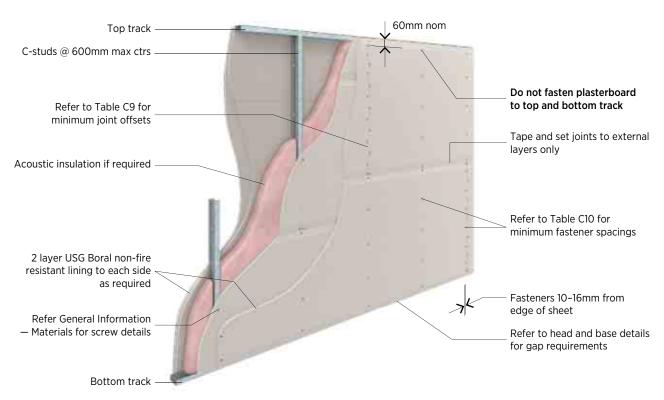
Non-Fire Rated Steel Stud - Horizontal Fixing - Double Layer
